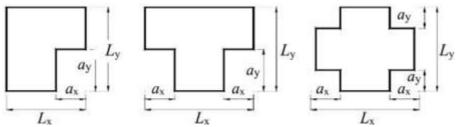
Arrangement of protrusions on the plan (Ax < 0.2 Lx and Ay < 0.2 Ly should be.) (TBDY, 2018)
